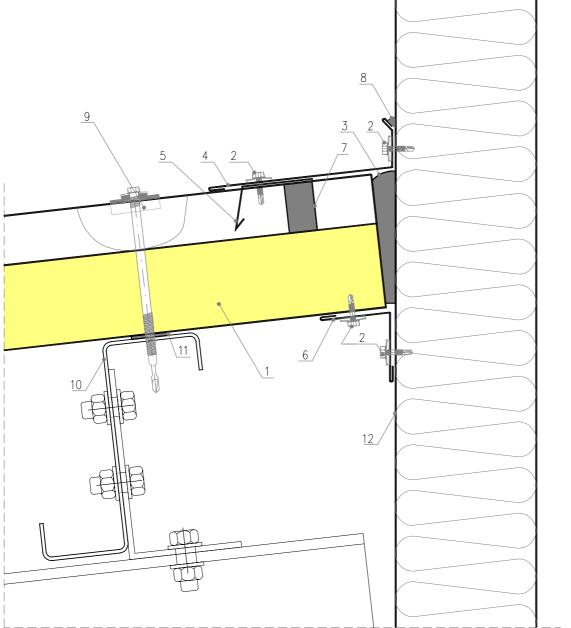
IzoRoof PIR/PIR+; MWF; EPS - roof edge next to higher building's wall
